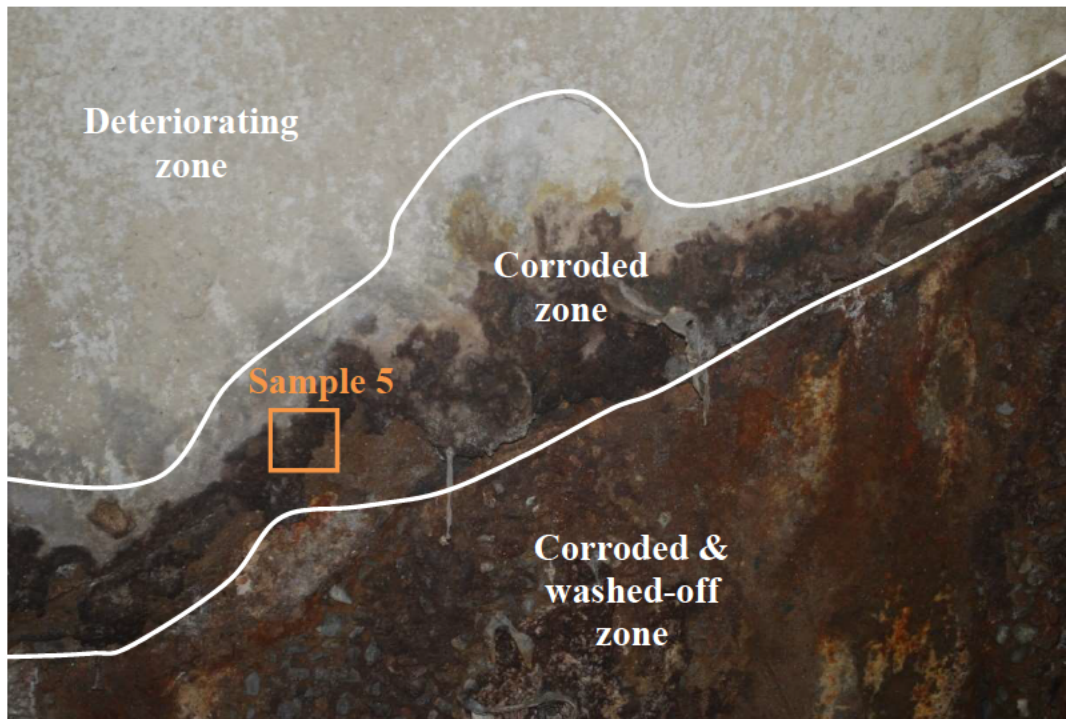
Sampling of corroded product on concrete wall
